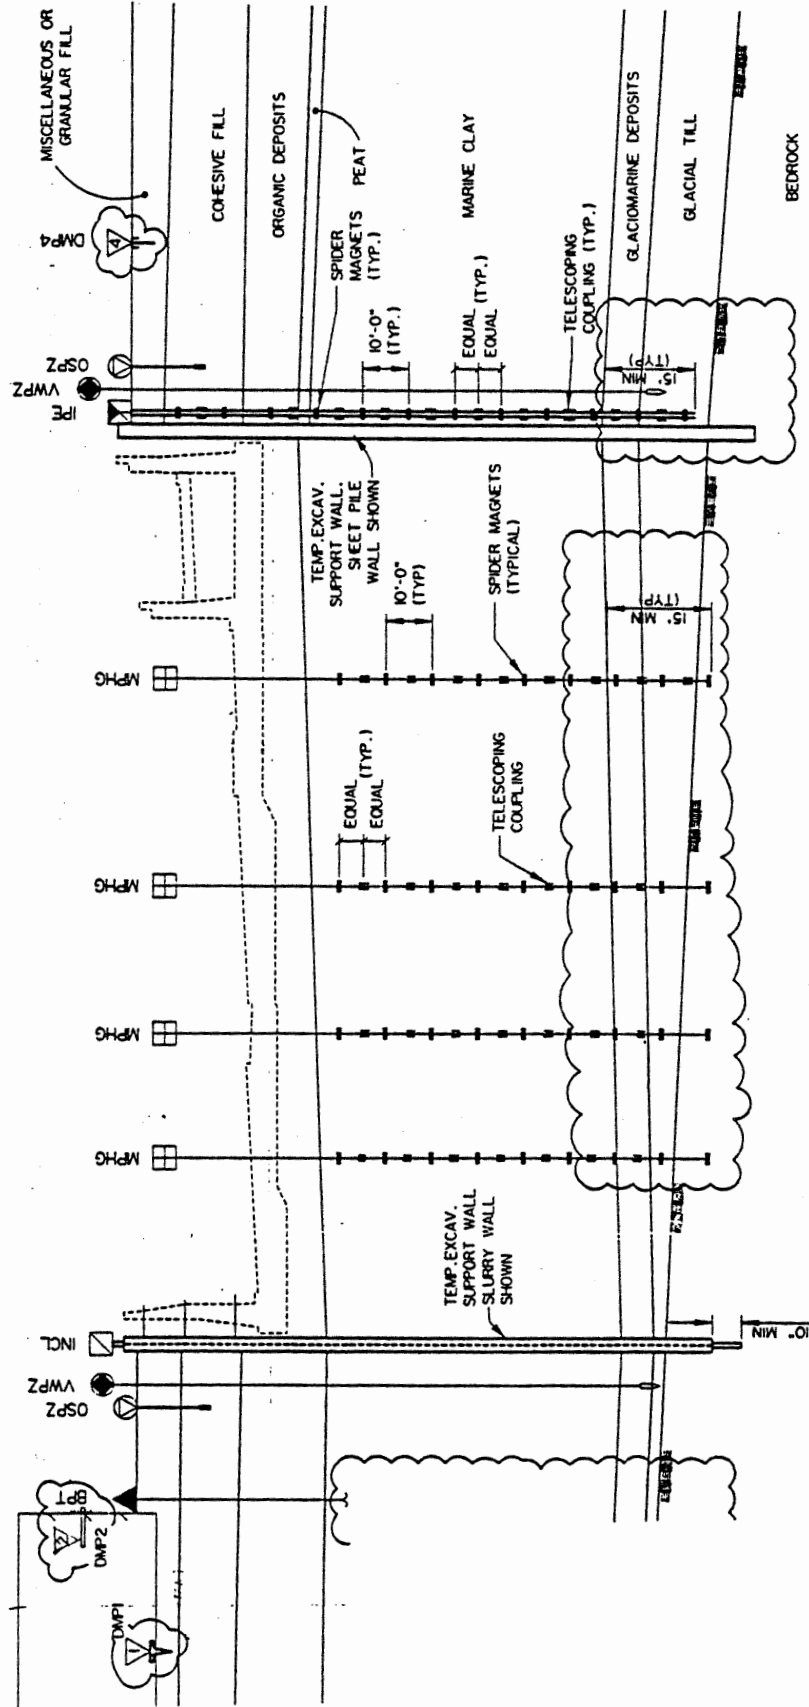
Cross-Sectional View of a "Typical" Instrumented Section Through the Project Alignment, Showing Locations and Depths of Geotechnical Instruments (MDPW, 1991).
